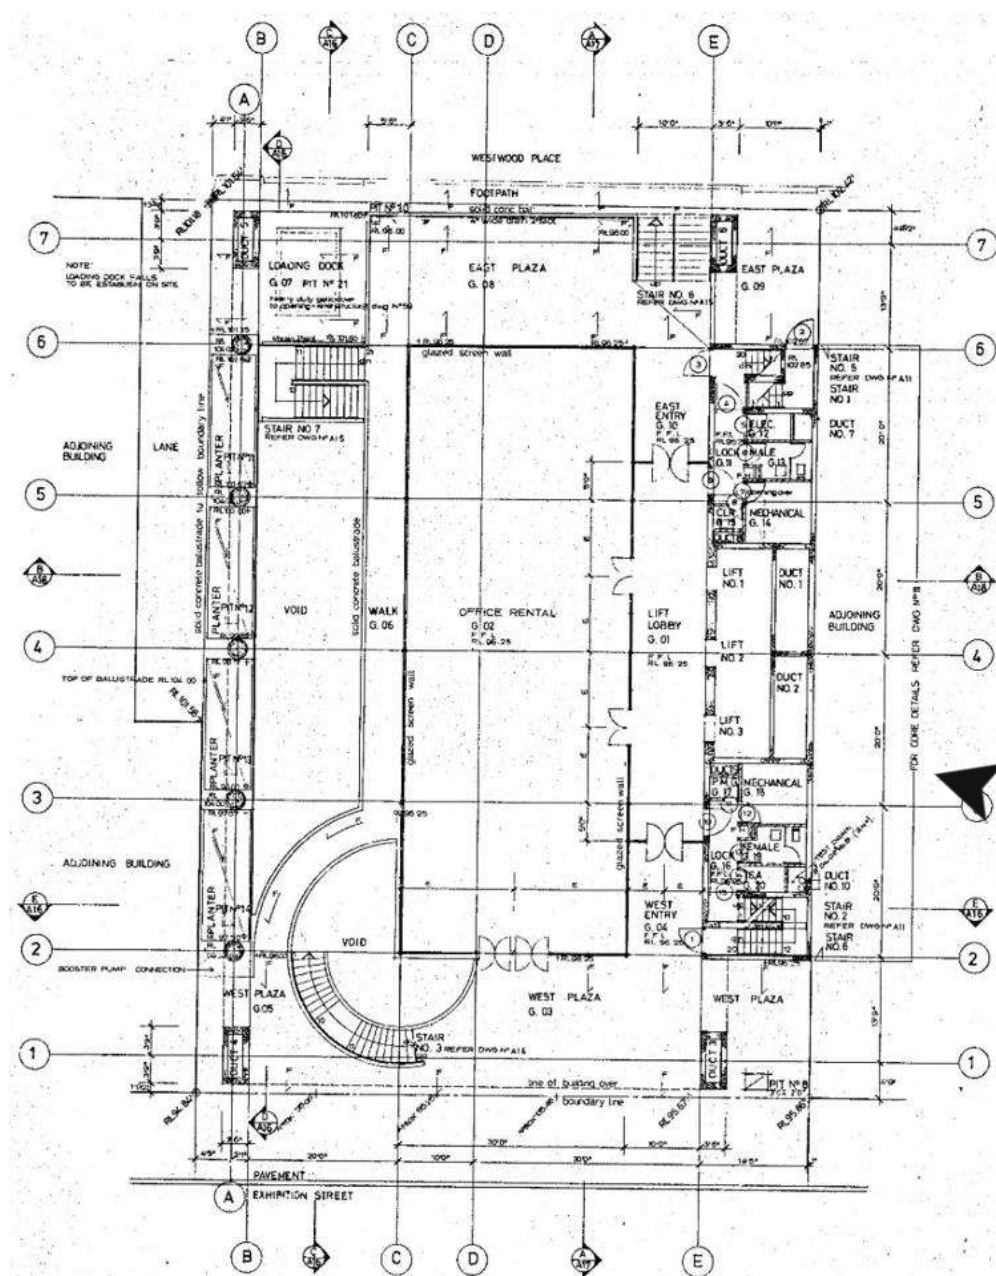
Detailed ground floor plan, dated 1975 (BAP).
